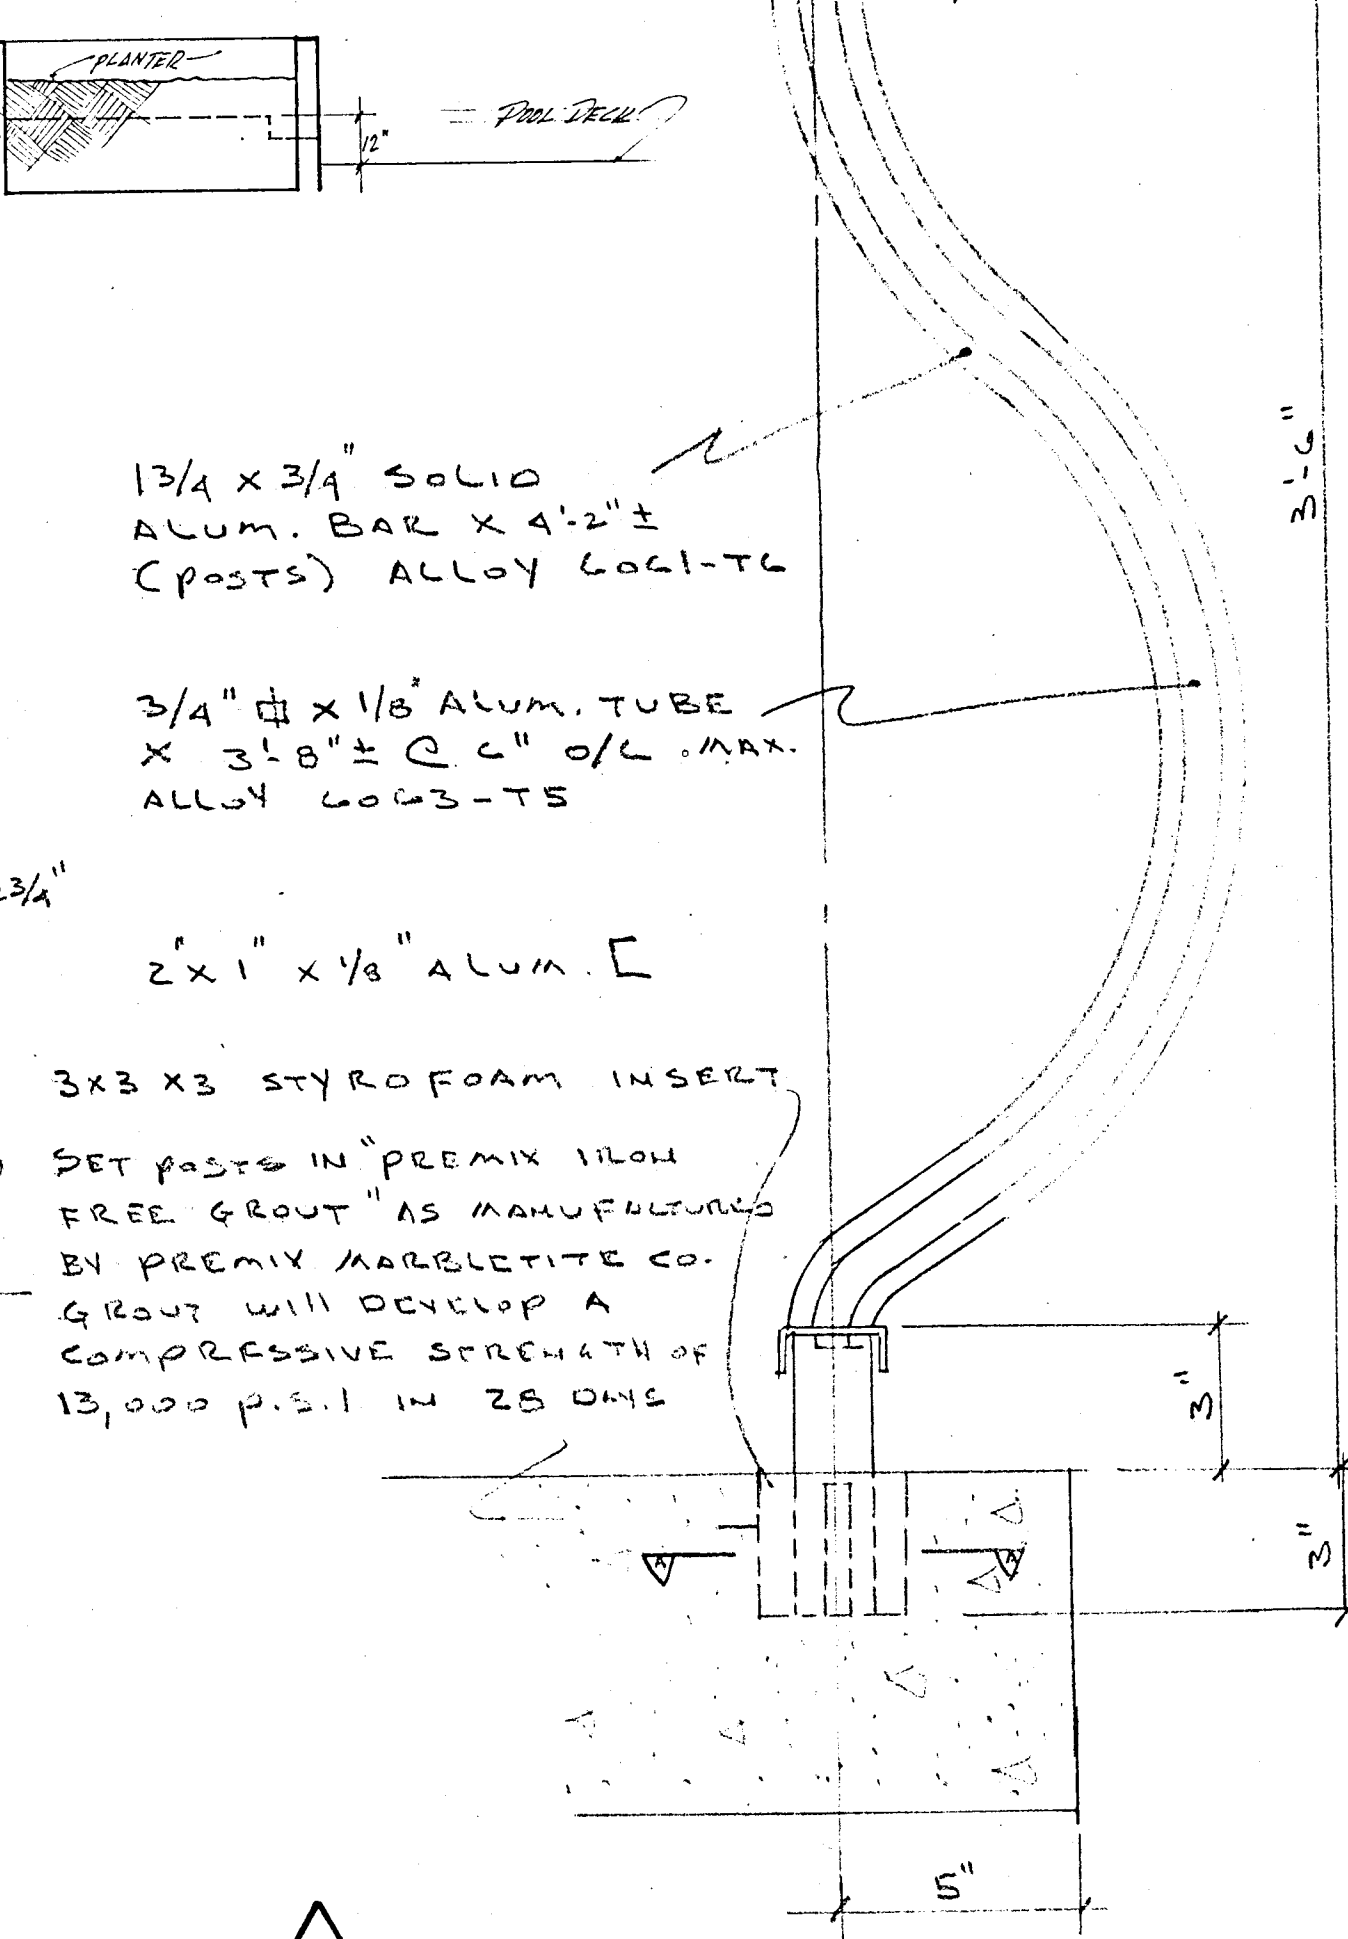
DETAIL ELEVATION C @ 1/4"=1'-0"
